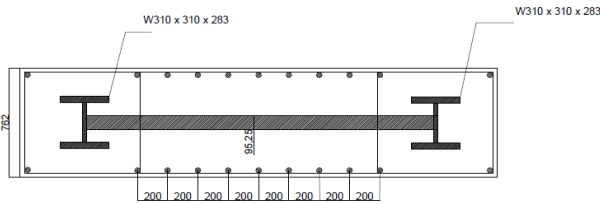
Cross Section Of Composite Shear Wall In Modeling (units are in mm)
